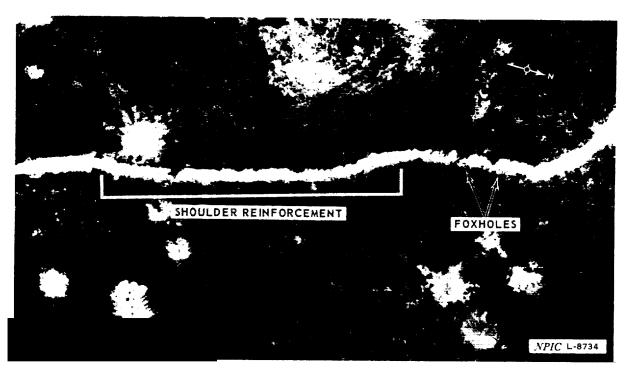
IMPROVED ROAD SECTION, ROUTE 137, NORTH VIETNAM
